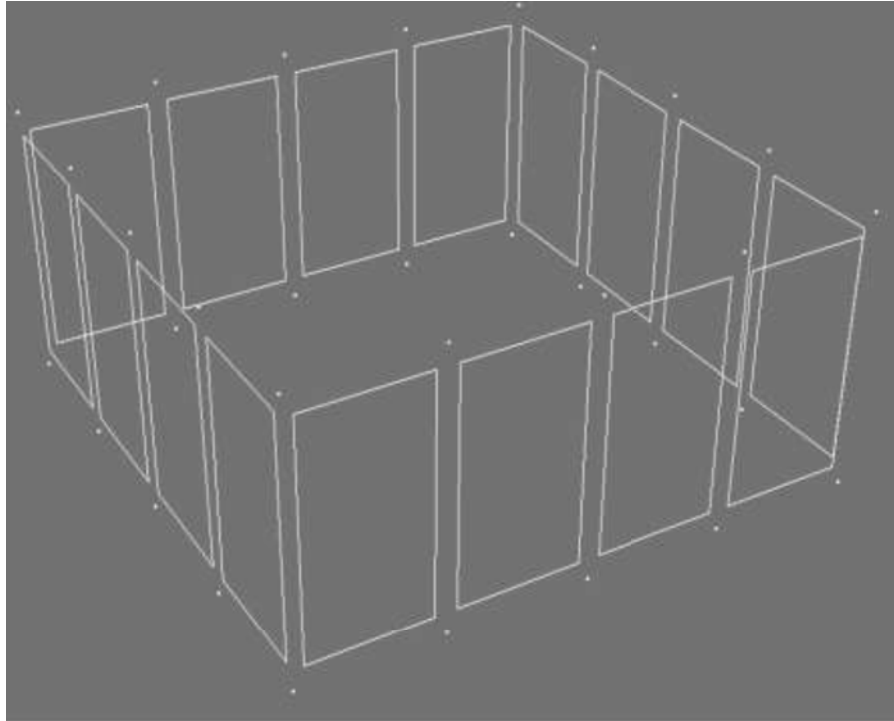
Concrete model #1- building without windows, doors, or canopy
